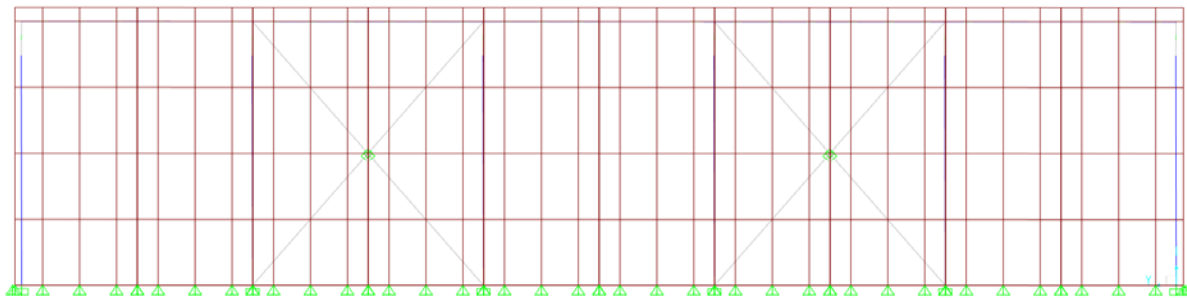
Mesh Refinement of Tilt-up Wall Panels
